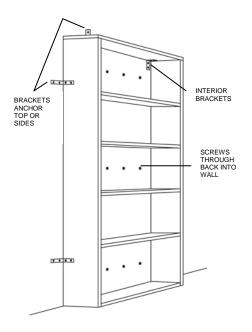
shows methods to anchor heavy, tall furniture to vertical wall studs, concrete, or masonry with steel angle brackets.
